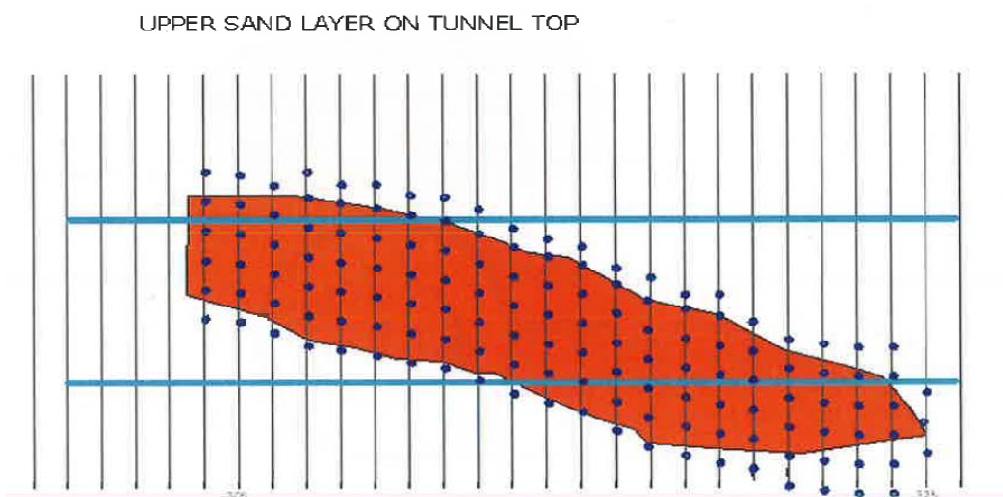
A nano grout was grouted from the top (street level) via numerous grouting ports using Tube-à-Manchette (TAM) grouting
